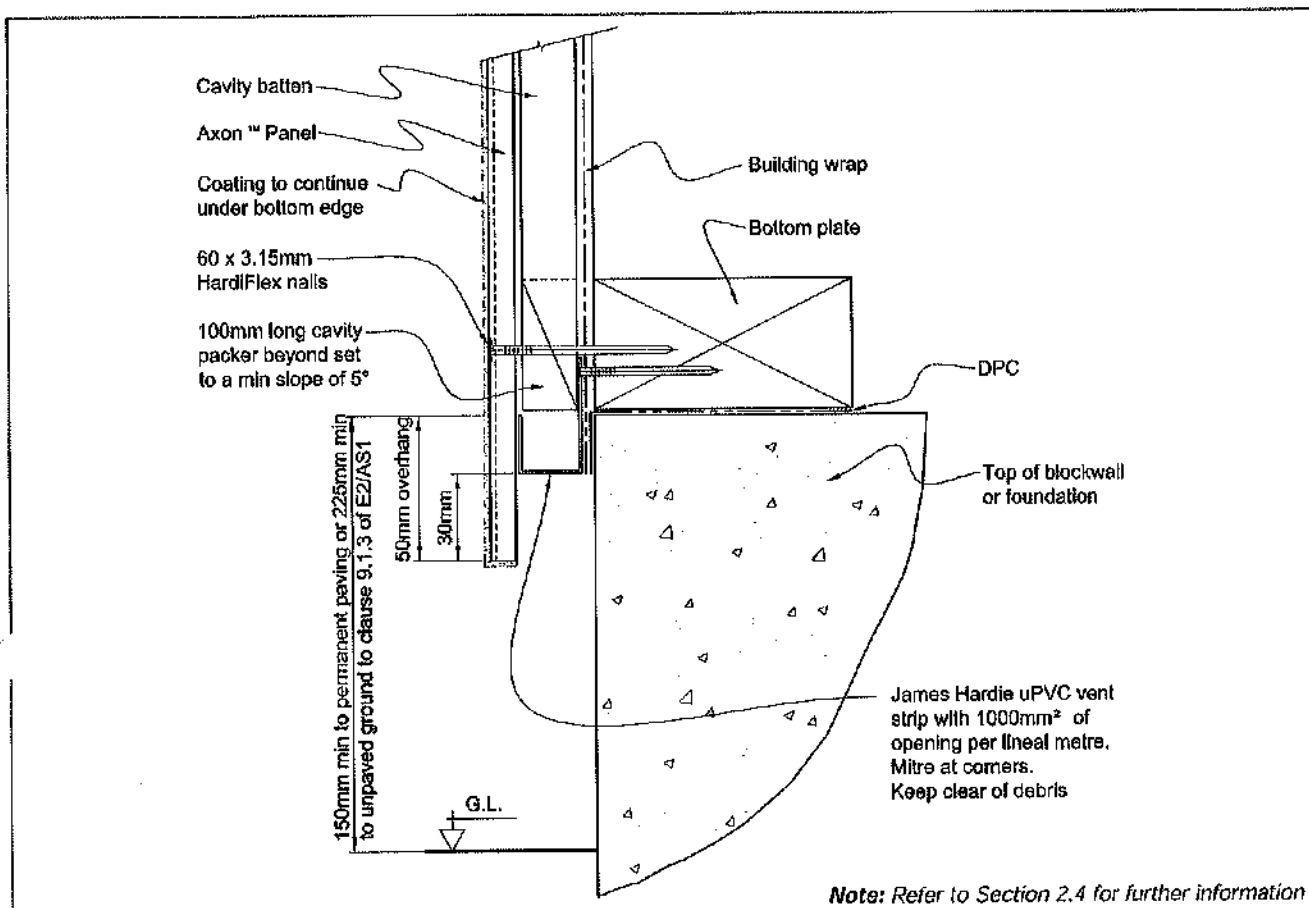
CAVITY FIXED FOUNDATION DETAIL
